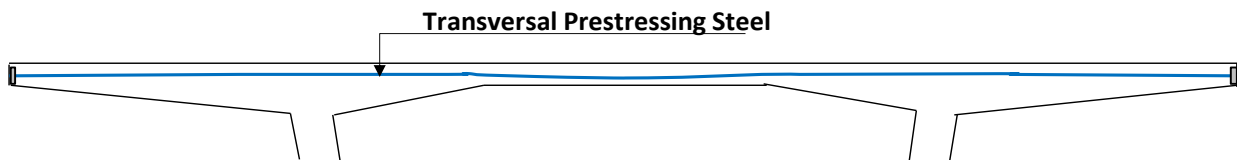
Transversal Prestressing of the Deck Slab of the PC Box Girder
